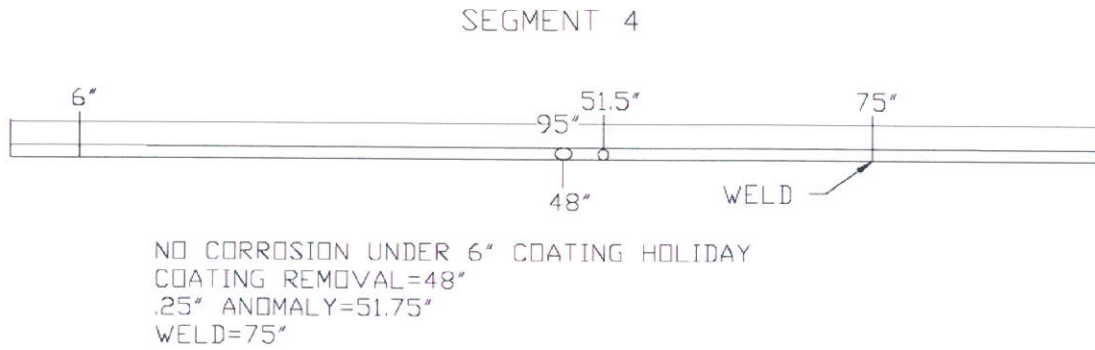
CAD schematic of Segment 4 showing anomalies and weld on pipe after coating removal.
